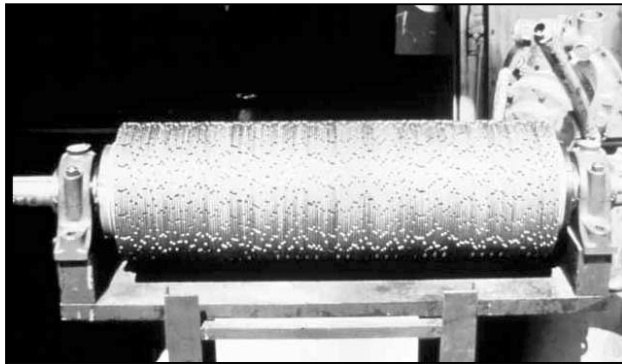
Cutting head of a diamond grinding machine. Note how the circular diamond blades are mounted to a shaft to form the cutting head.
